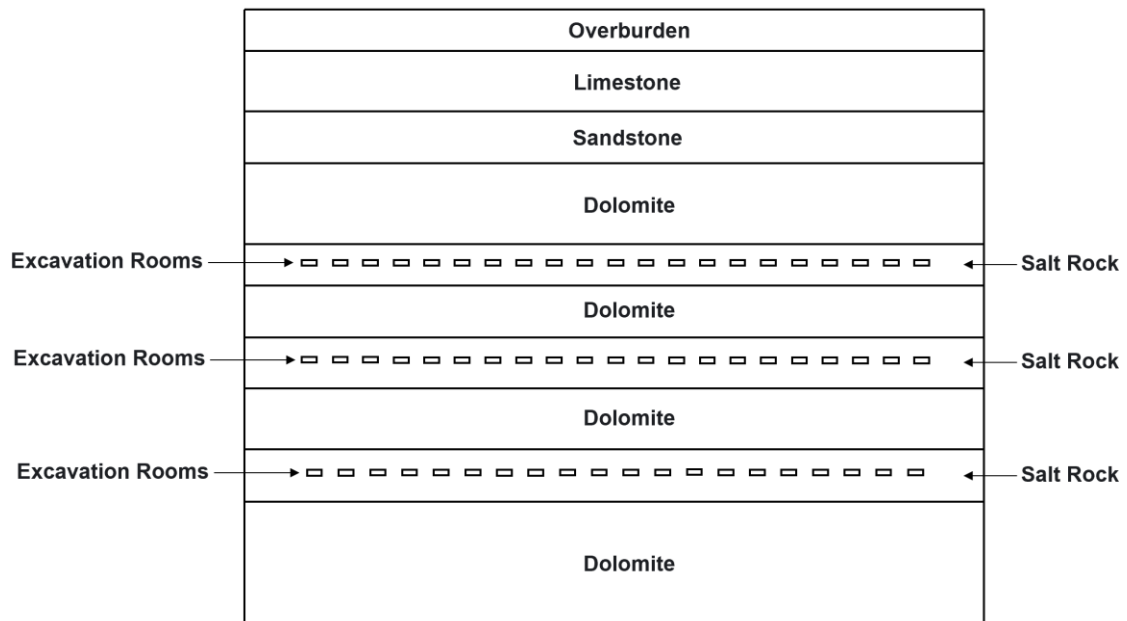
Stratigraphy and room and pillar excavation layout (front view).
